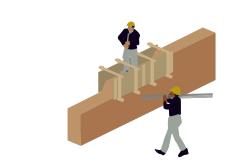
Addition of Reinforcements and Compaction of Rammed Earth Walls
